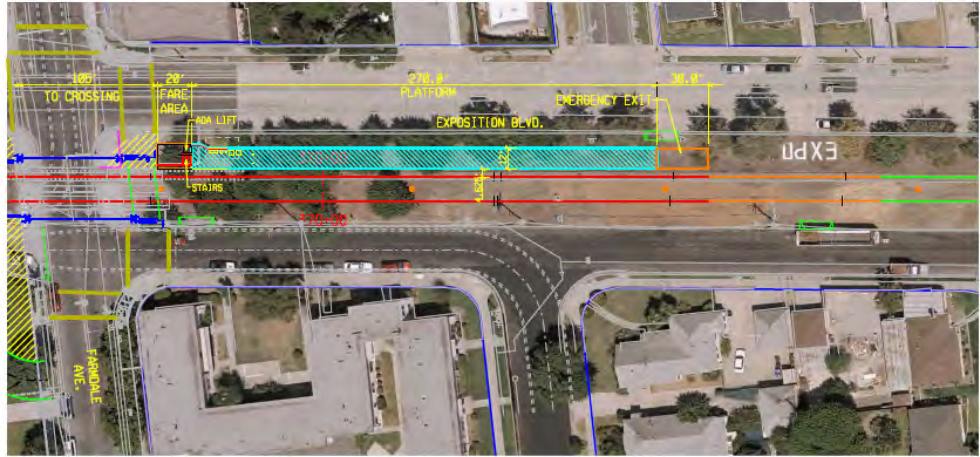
Proposed LRT Passenger Station Plan with At-grade Crossing – Eastbound Platform, West of Farmdale Avenue
